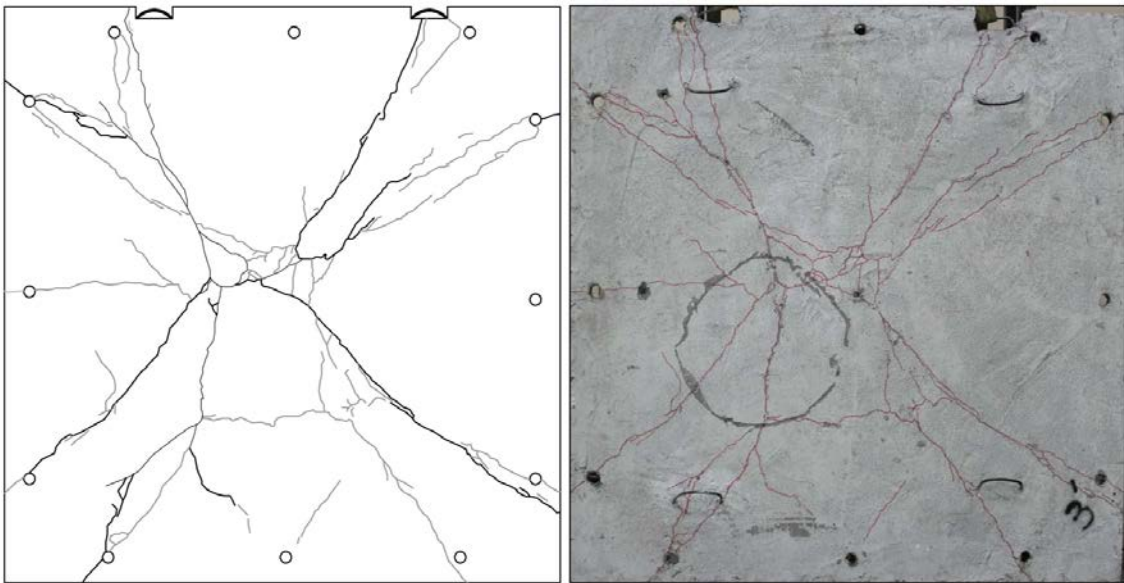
Front Face Crack Patterns After Testing for Panel JA3-075+PVA
